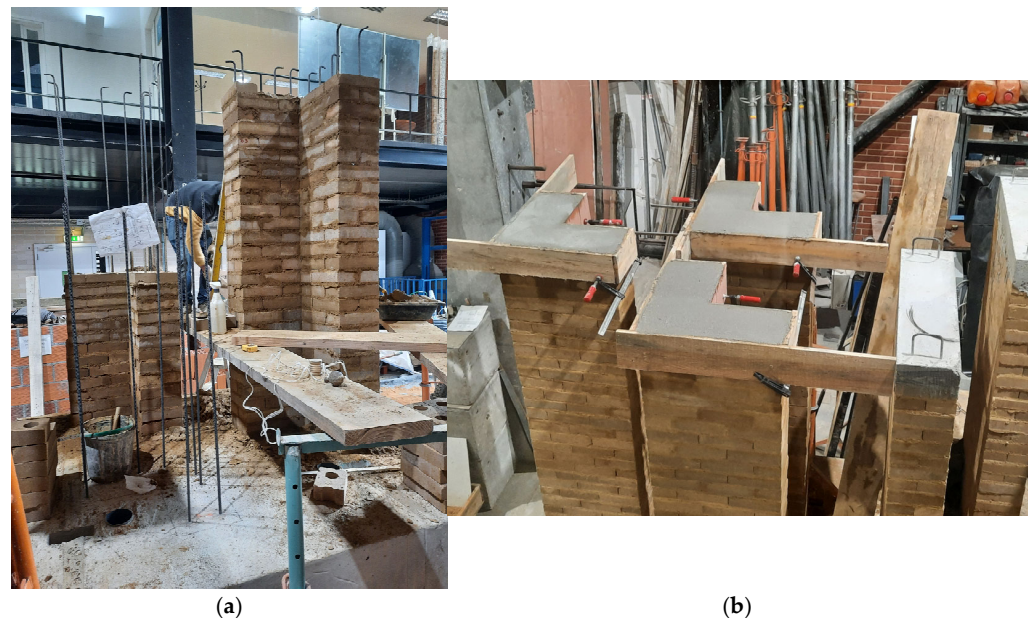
L-panel specimens' construction for bending shear testing: (a) Vertical reinforcements within the blocks' holes; (b) Concrete molding at the panels' top.
